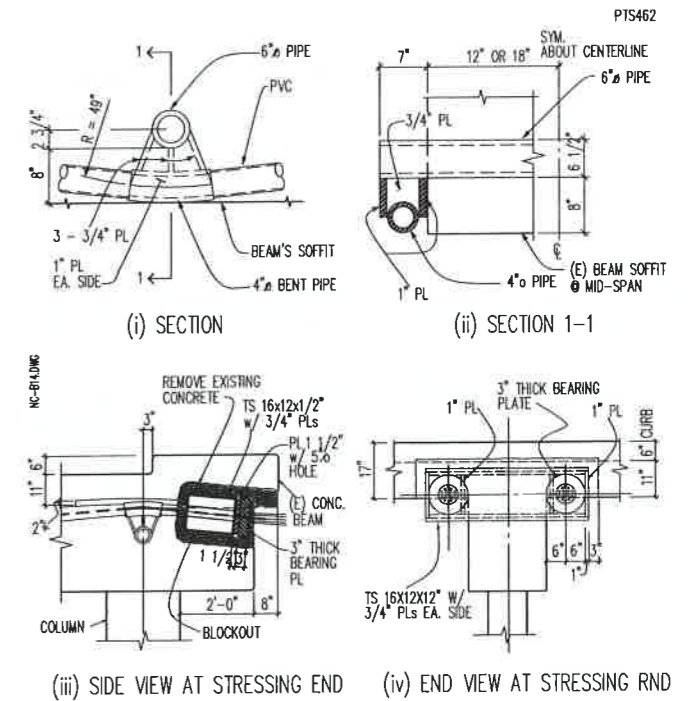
A-3 Tendon Deviator and End Block Details (Pier 39 Parking Structure; San Francisco)
